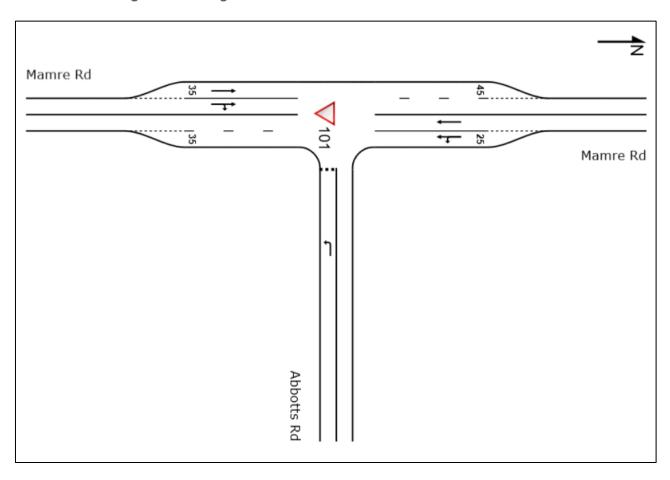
Mamre Road / Abbotts Road Upgrade Layout - Construction Stage 11
